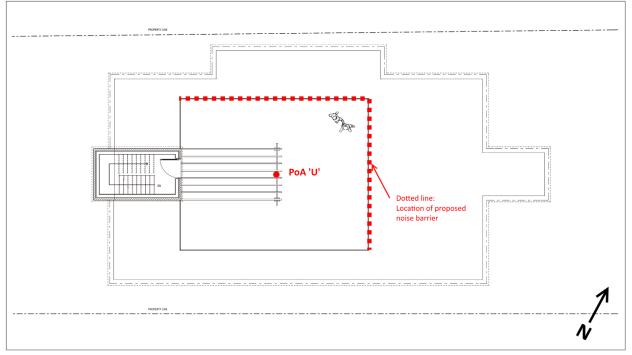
Site plan showing location of Point of Reception POA 'U' on the rooftop of Building 'B'.
